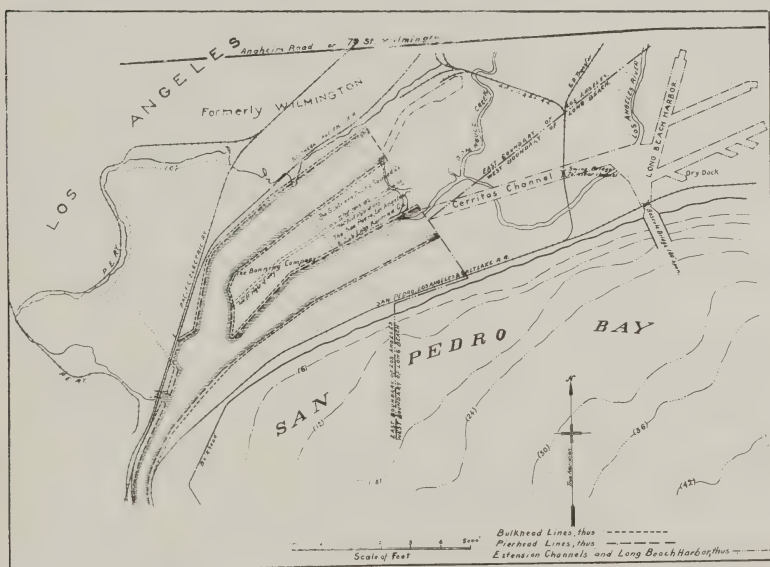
Plate IV. Hachured lines show Peninsula Plan, proposed by private interests for the east basin of the Inner Harbor in 1906. Note that no provision was made for the west basin.
